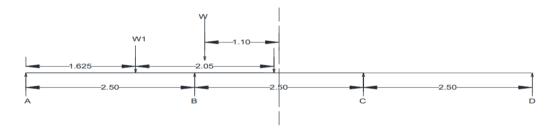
I section Girder Transverse Disposition of IRC Class AA Tracke Vehicle
